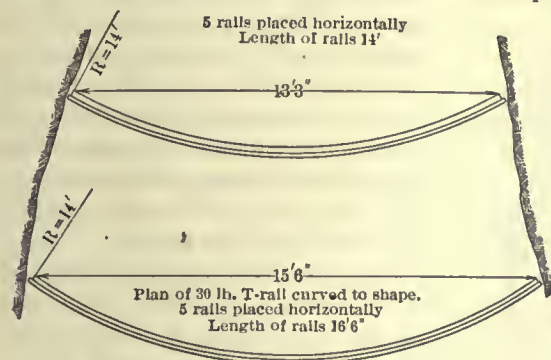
DETAIL OF REINFORCEMENT GRILL BUILT OF 30-POUND MINE RAILS FOR 16TH-LEVEL BULKHEAD. RAILS SPACED AT 2-FOOT CENTERS
